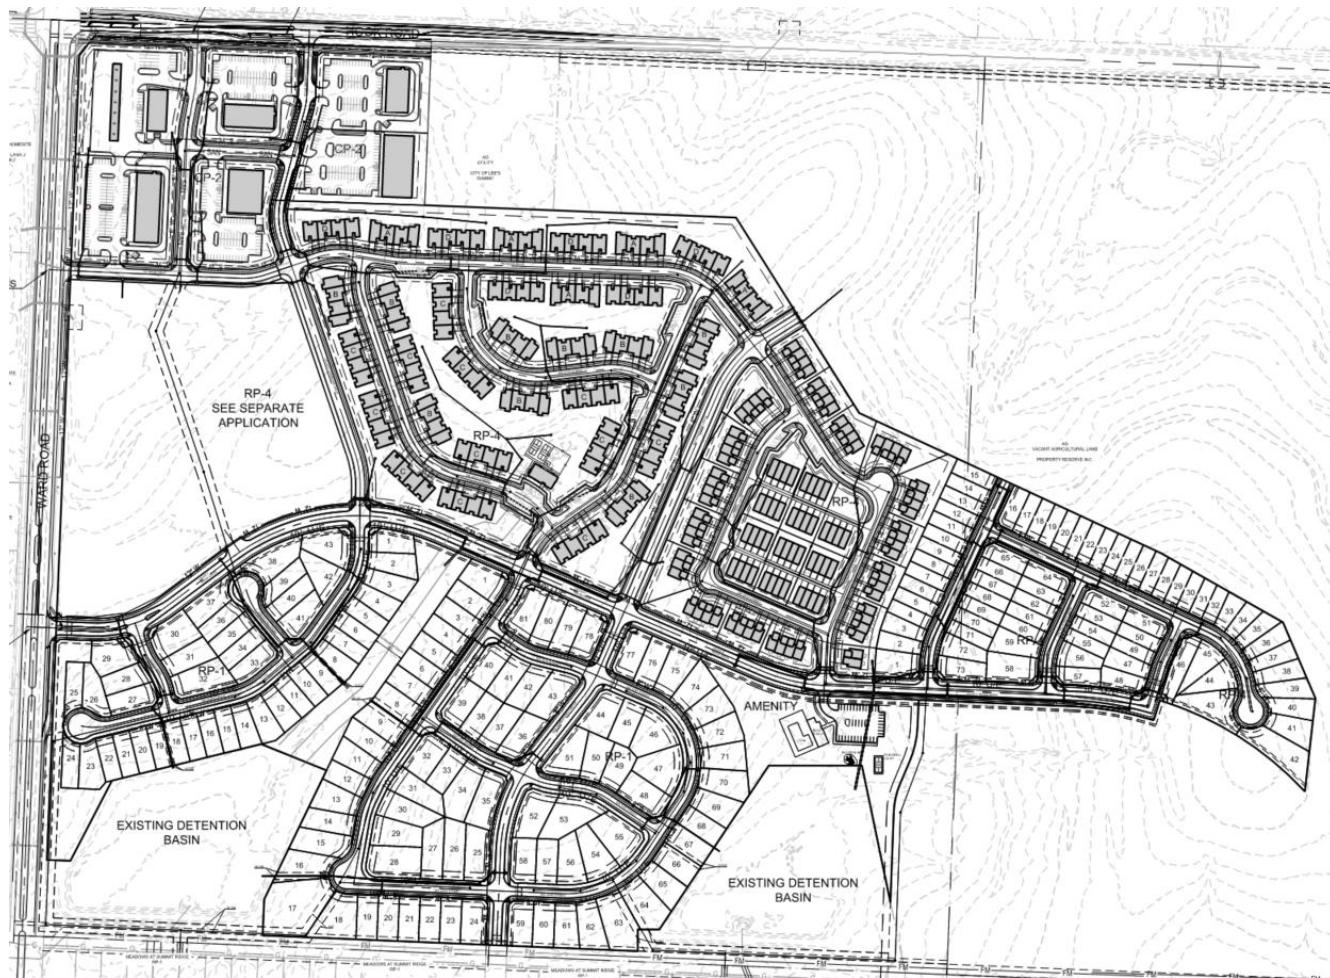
Preliminary Development Plan and Conceptual Development Plan
